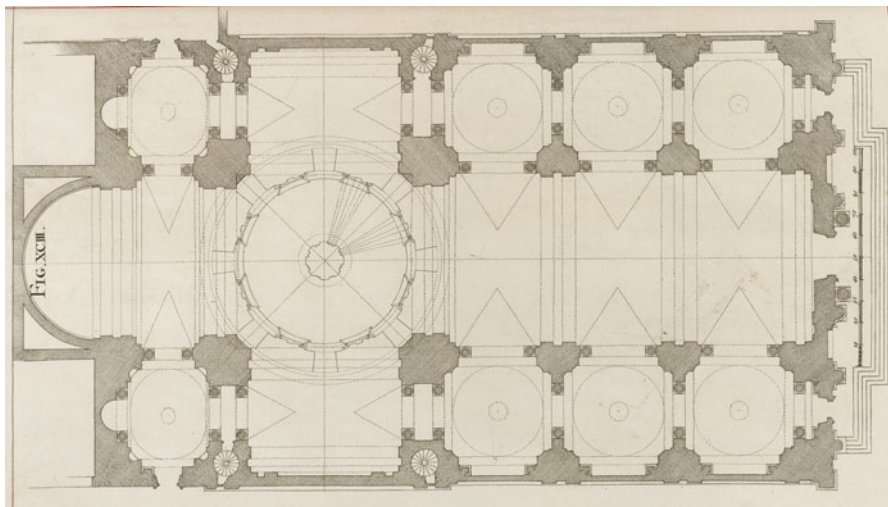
Plan of the church of Sant' Ignazio, Rome (Note the plan of his feigned dome over the crossing, from Pozzo (1707, Figure 93), turned 90° so it corresponds to the elevation in Fig. 12)
